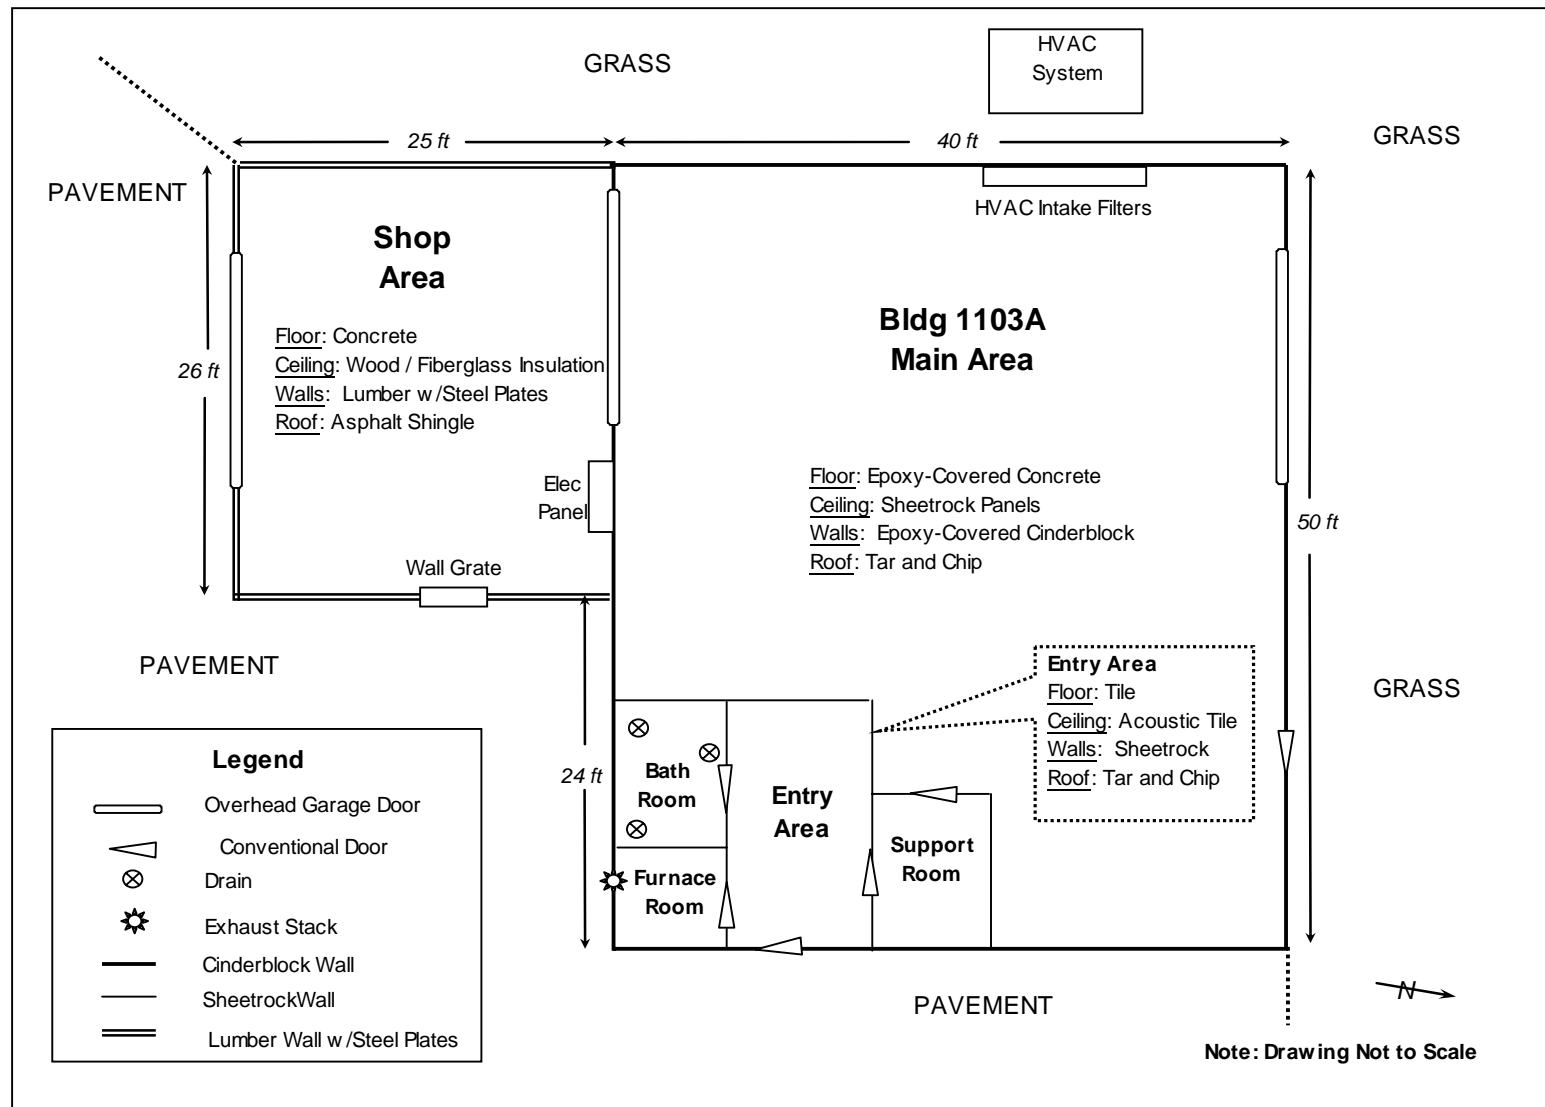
BUILDING 1103A FLOOR PLAN
